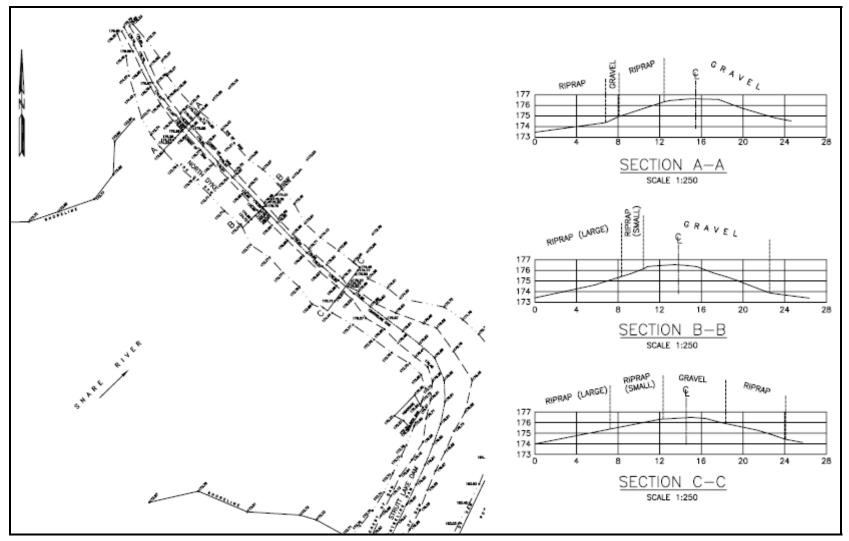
Snare Forks – 2003 North Dyke Survey: Plan and Typical Sections
